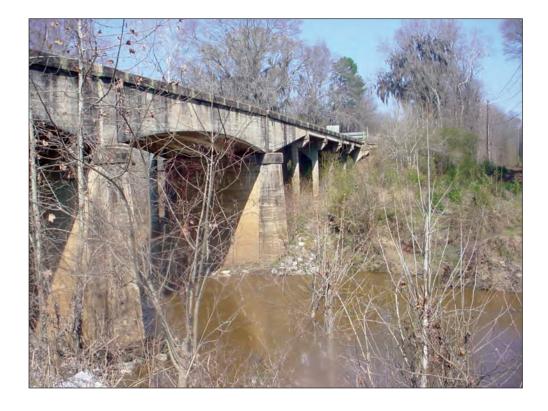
Norman Bridge Road crossing, Montgomery, Alabama. (See figure 7 for location.)
